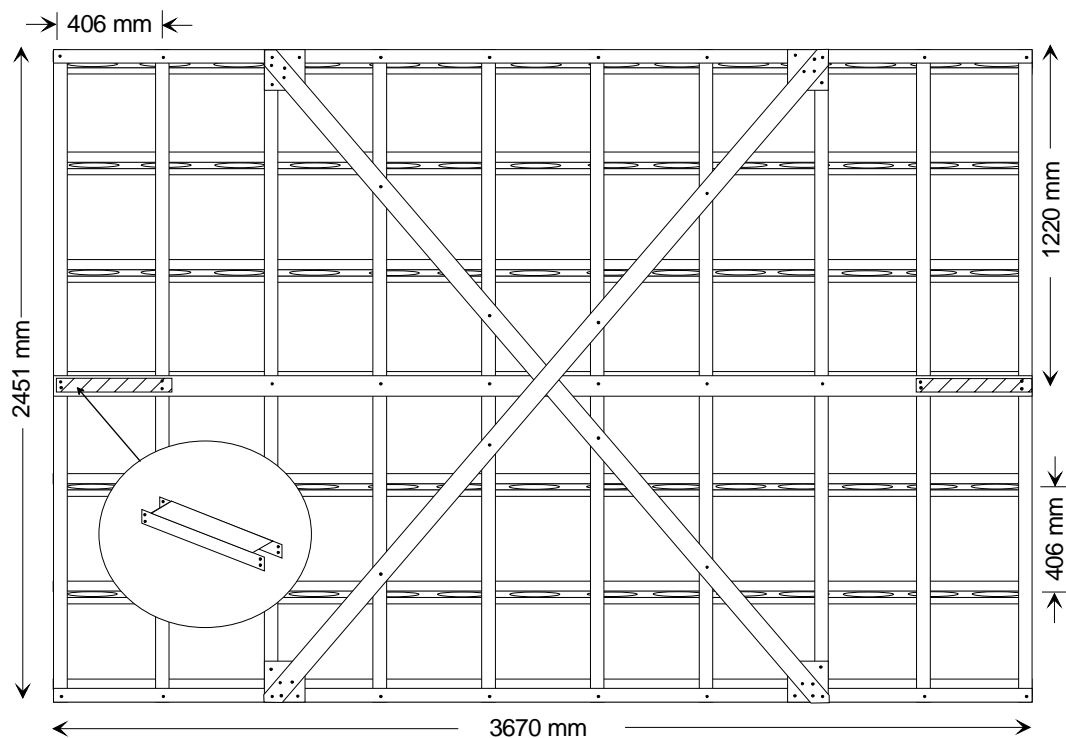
Sketch showing the location of the solid blocking used in Assembly TLA-99-129. Other construction elements are unchanged from Figure A-2 and A-1.
